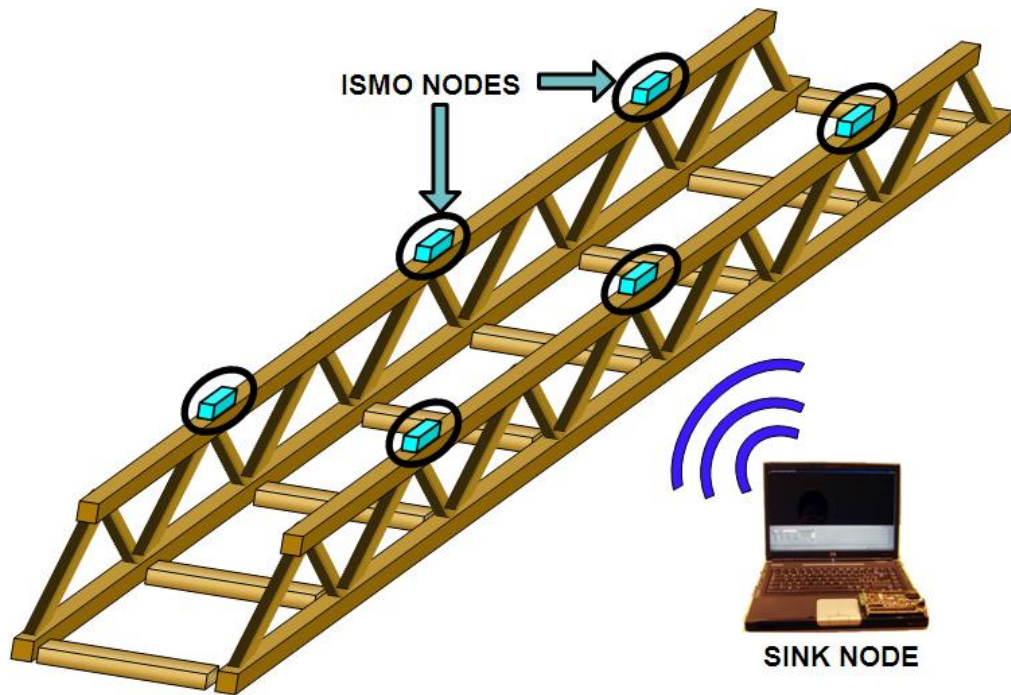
Test setup with wireless sensors placed on the wooden bridge (Bocca *et al.*, 2009).
